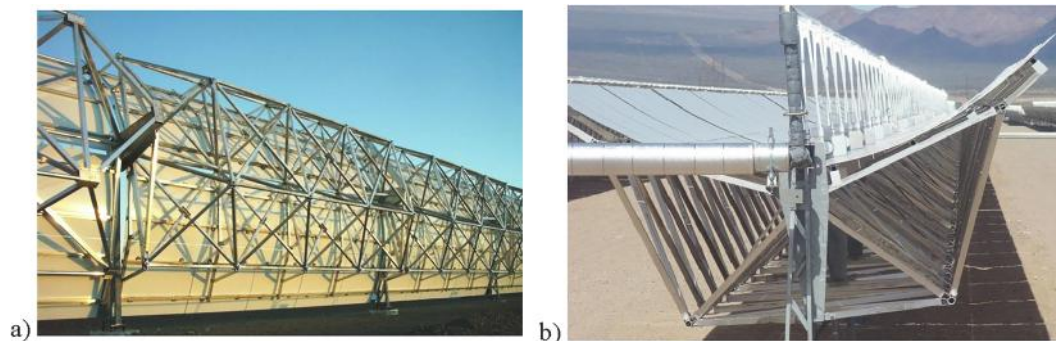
a) and b) SGX-2 extruded aluminium profile space frame collector at 64 MW Nevada Solar One solar power plant (Speciality Structures and Installations, 2017).
